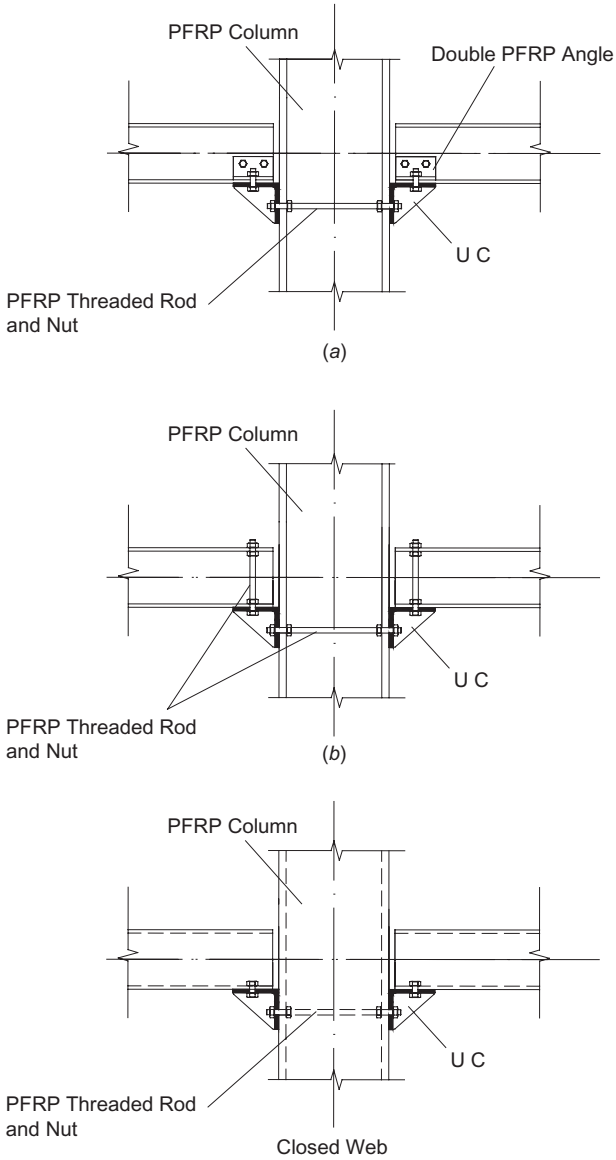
Flexible interior (UC seat) PFRP beam-to-column connection details.
